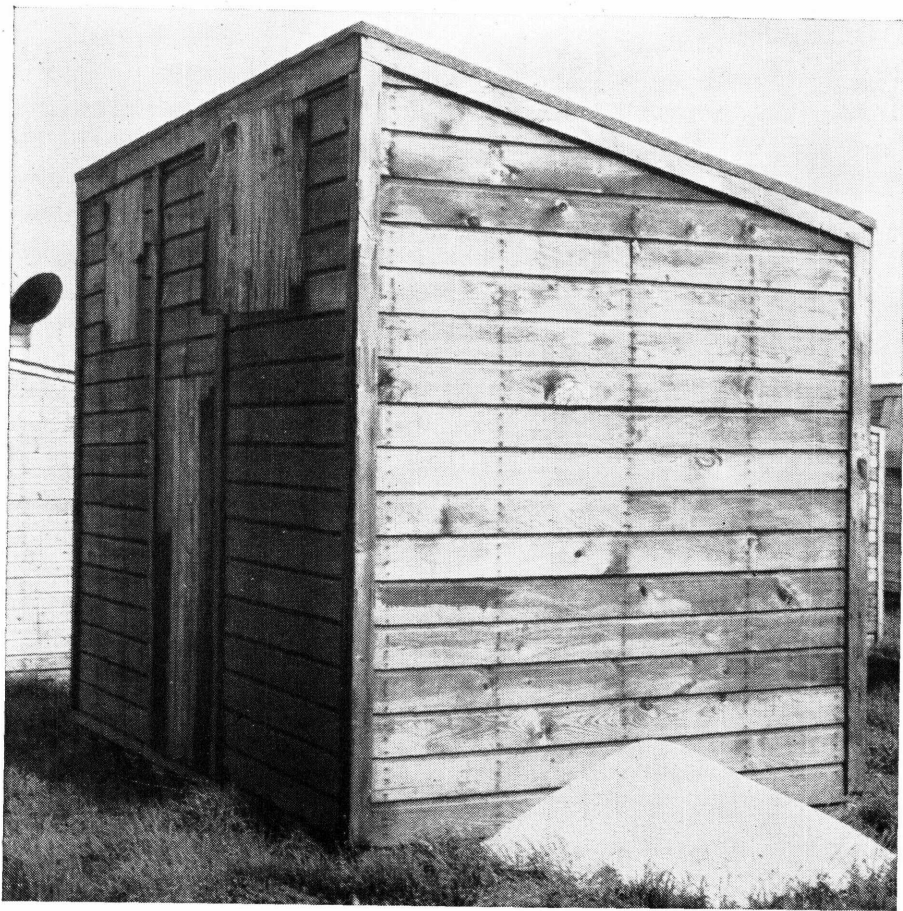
Grain spilled onto the ground because of failure of a poorly built bin. A bin may fail because of poor nailing, the use of studs that are not sound, or the use of an inferior grade of siding. In this case the nailing was not adequate.
